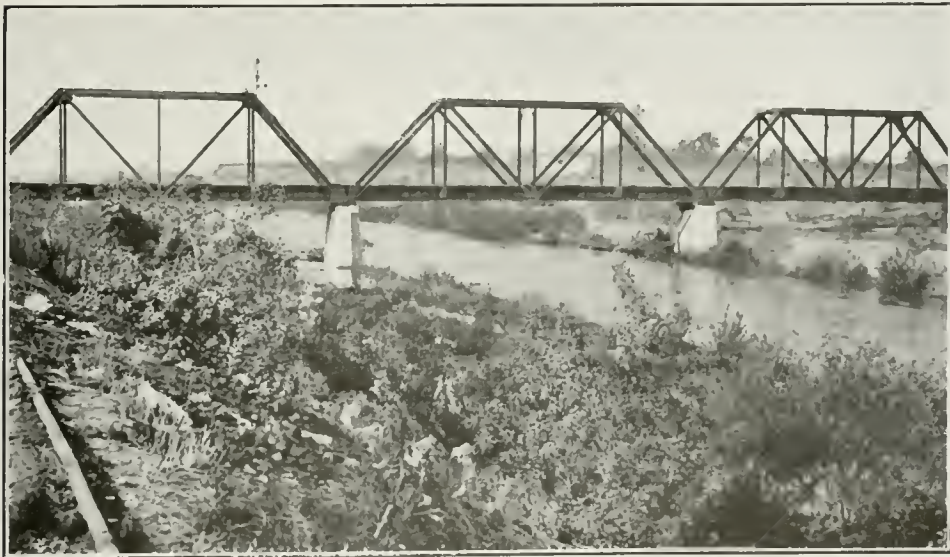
SALT LAKE BRIDGE ACROSS LOS ANGELES RIVER AT RUTTE STREET
